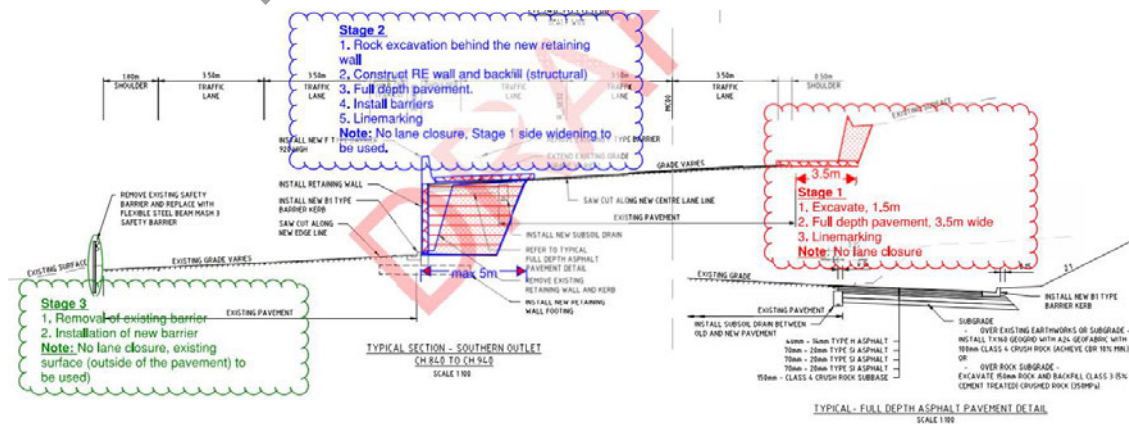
Typical section – Southern Outlet Ch. 840 to Ch. 940
